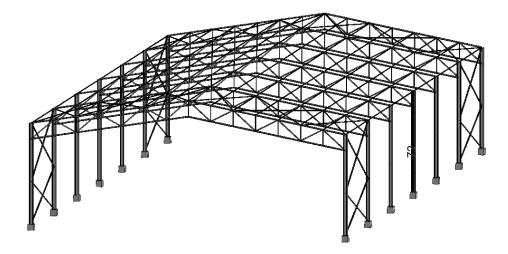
Structural design of hypothetical example 1 (steel truss framing with parallel uprights)
